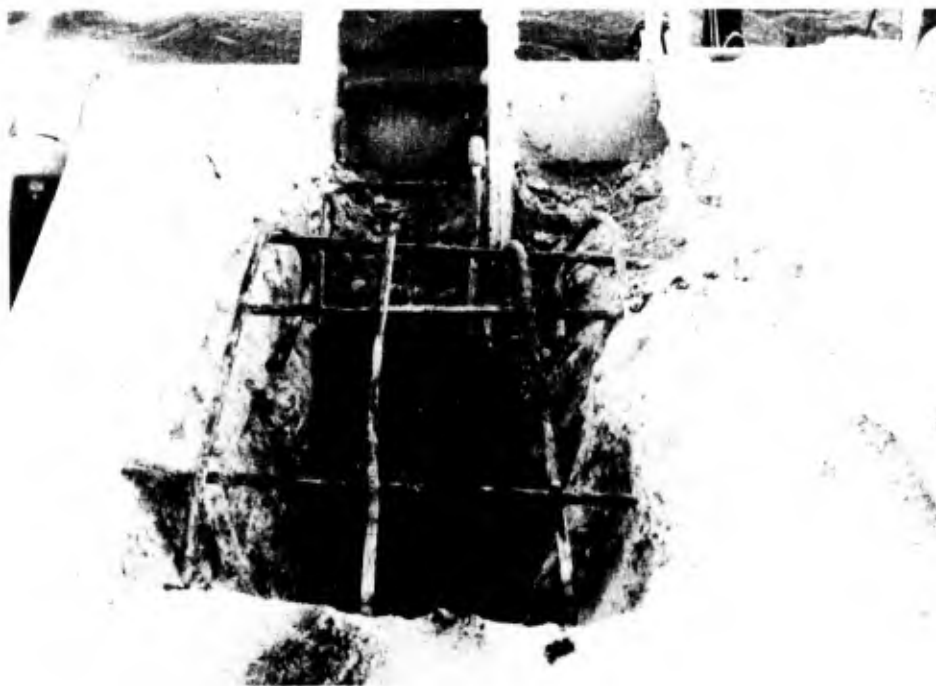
Looking downstream at trunnion shaft area. Portions of anchorage steel (head plates) and reinforcing steel exposed by excavating the surrounding concrete, Lock and Dam No. 24, Mississippi River
